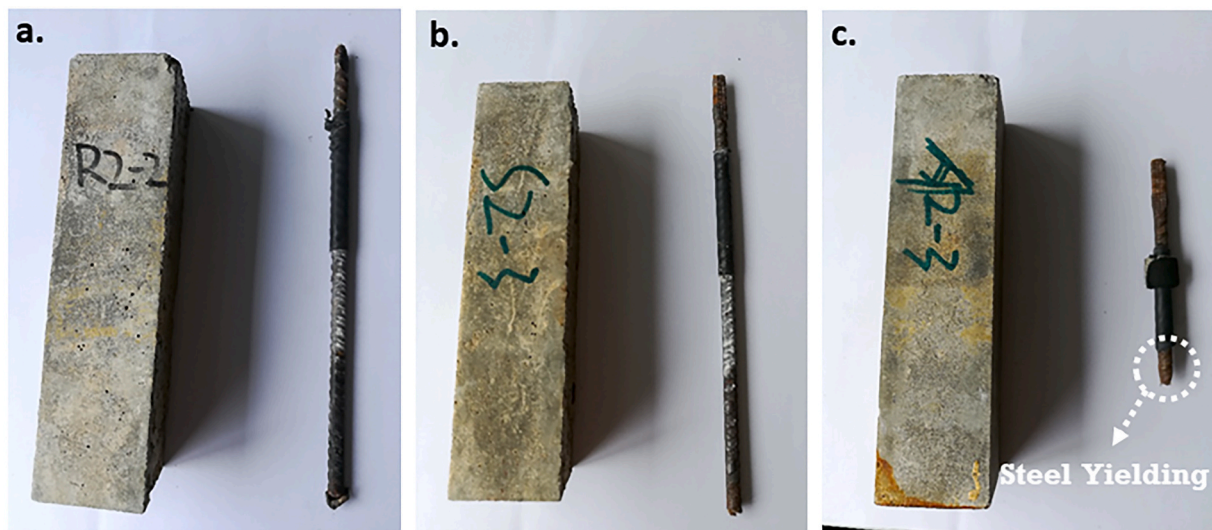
Specimens after pull-out: (a) R-28 d; (b) S-28 d; (c) A-28 d.
